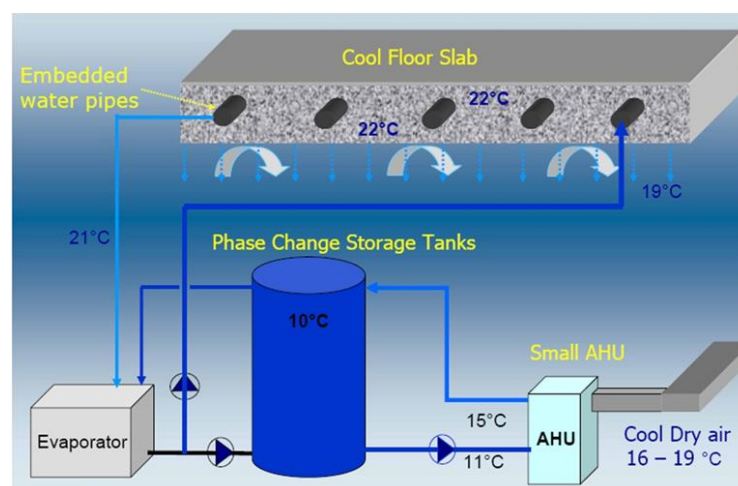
Chilled water tubes are embedded into the floor slabs acting as a heat sink, in GEO building
